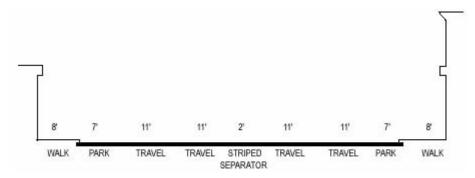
Cross-Section 50 Feet West of Main Street, Looking West
